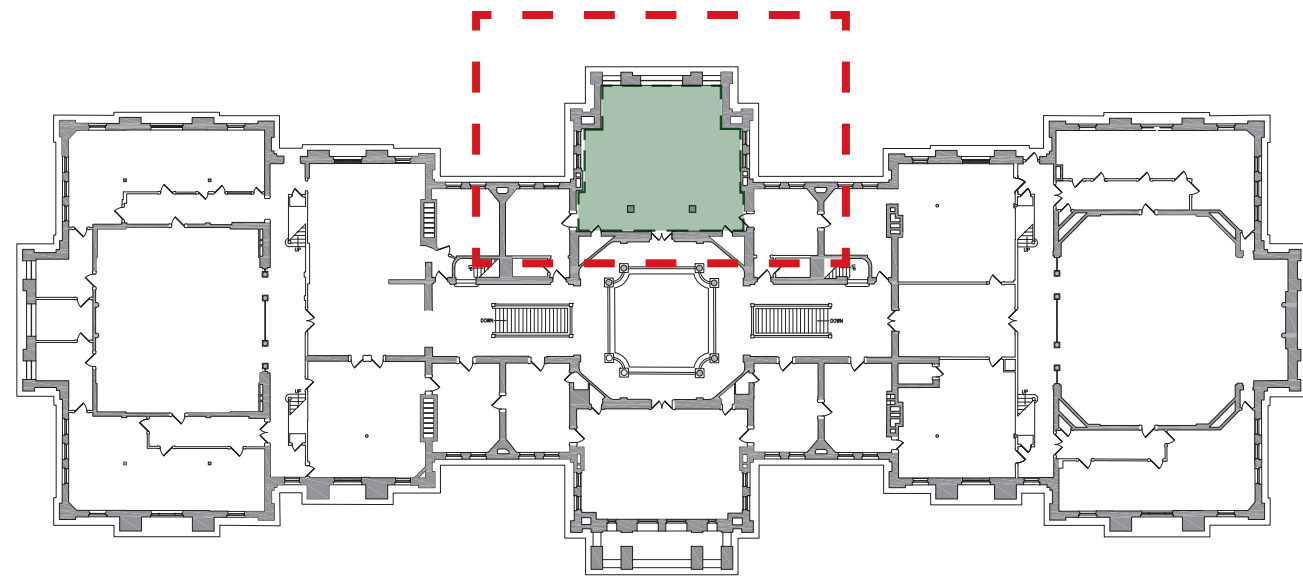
Second Floor Level Selective Removals Plan.
